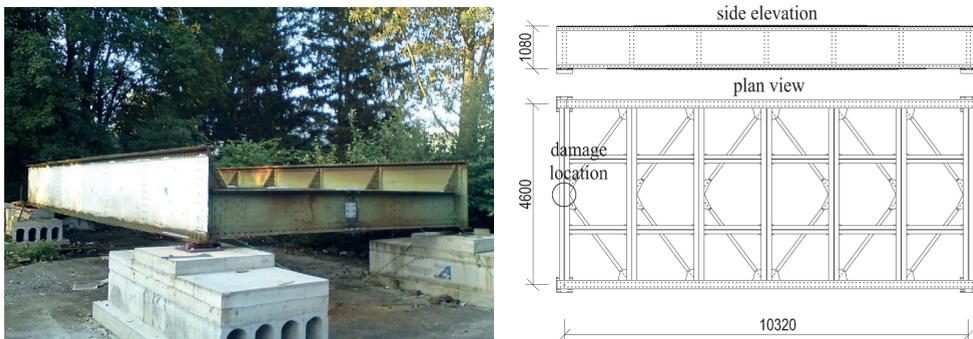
Photo and side elevation, and plan view of Rohrbach bridge.
